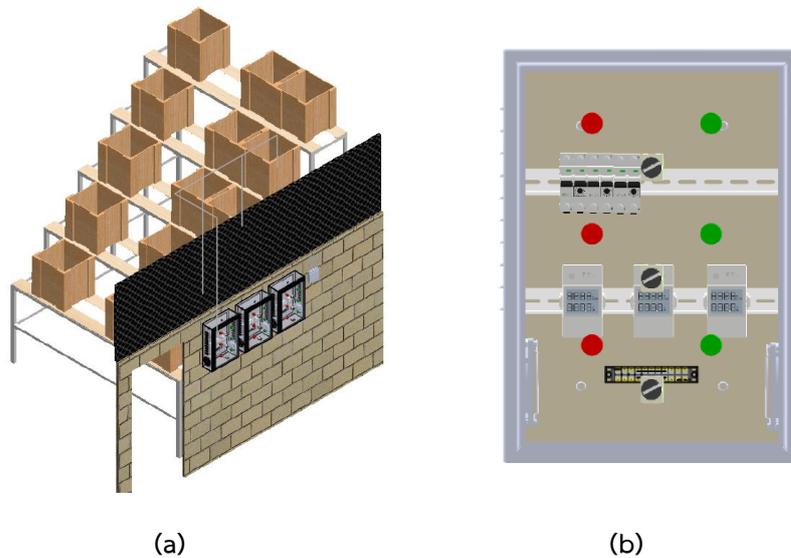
(a) Overall installation structure, and (b) Equipment layout inside the control panel.
